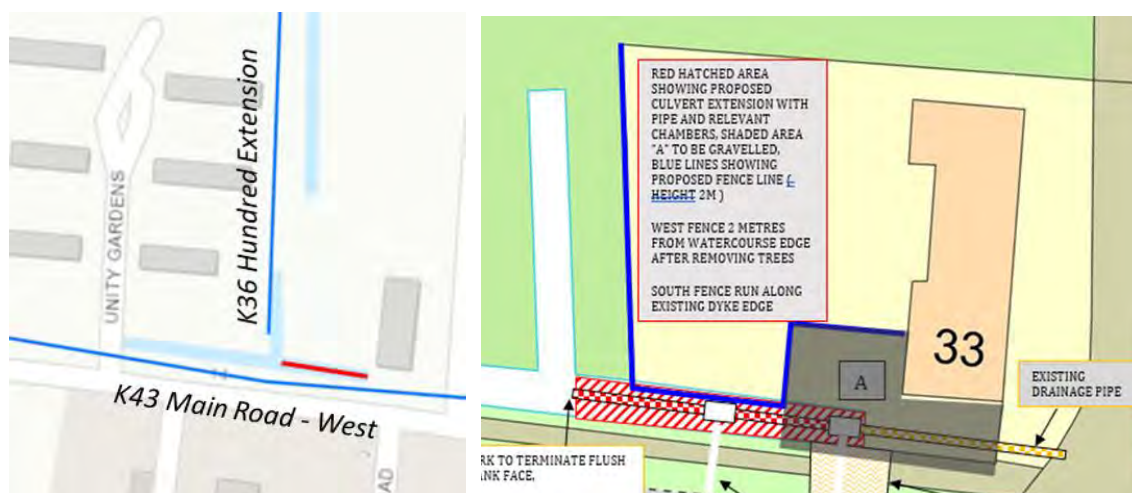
Location of proposed section to be culverted (red line) adjacent to site plan.
